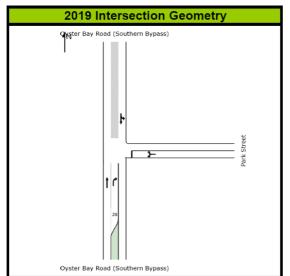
Proposed geometry of Oyster Bay Road (Southern Bypass) / Park Street
